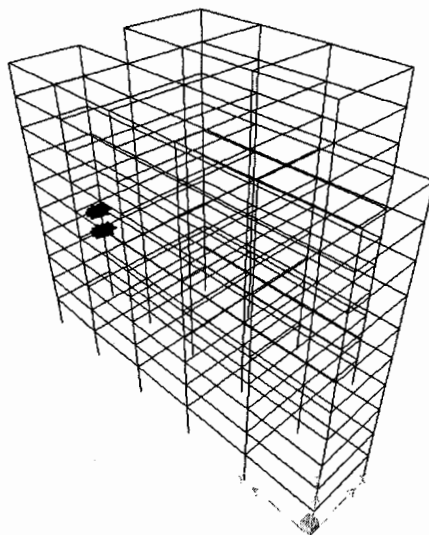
Computer Model of the Tarzana Building with Damaged Joints Identified.
